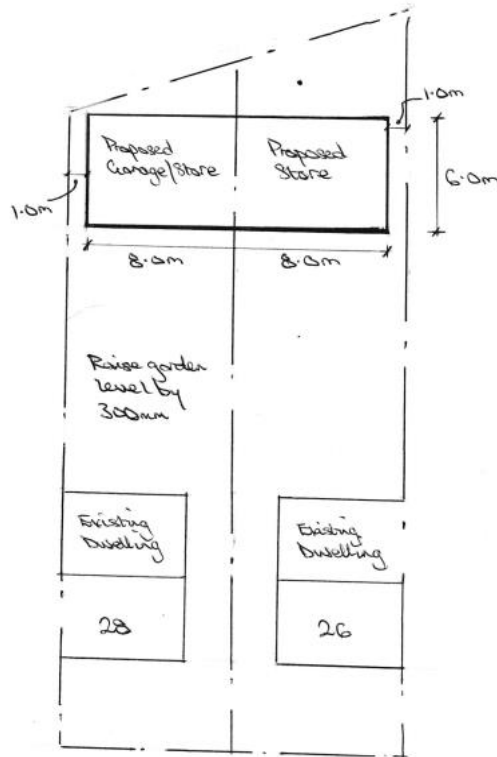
Site Layout Plan (inc. the proposals for 26, Pant Glas)
